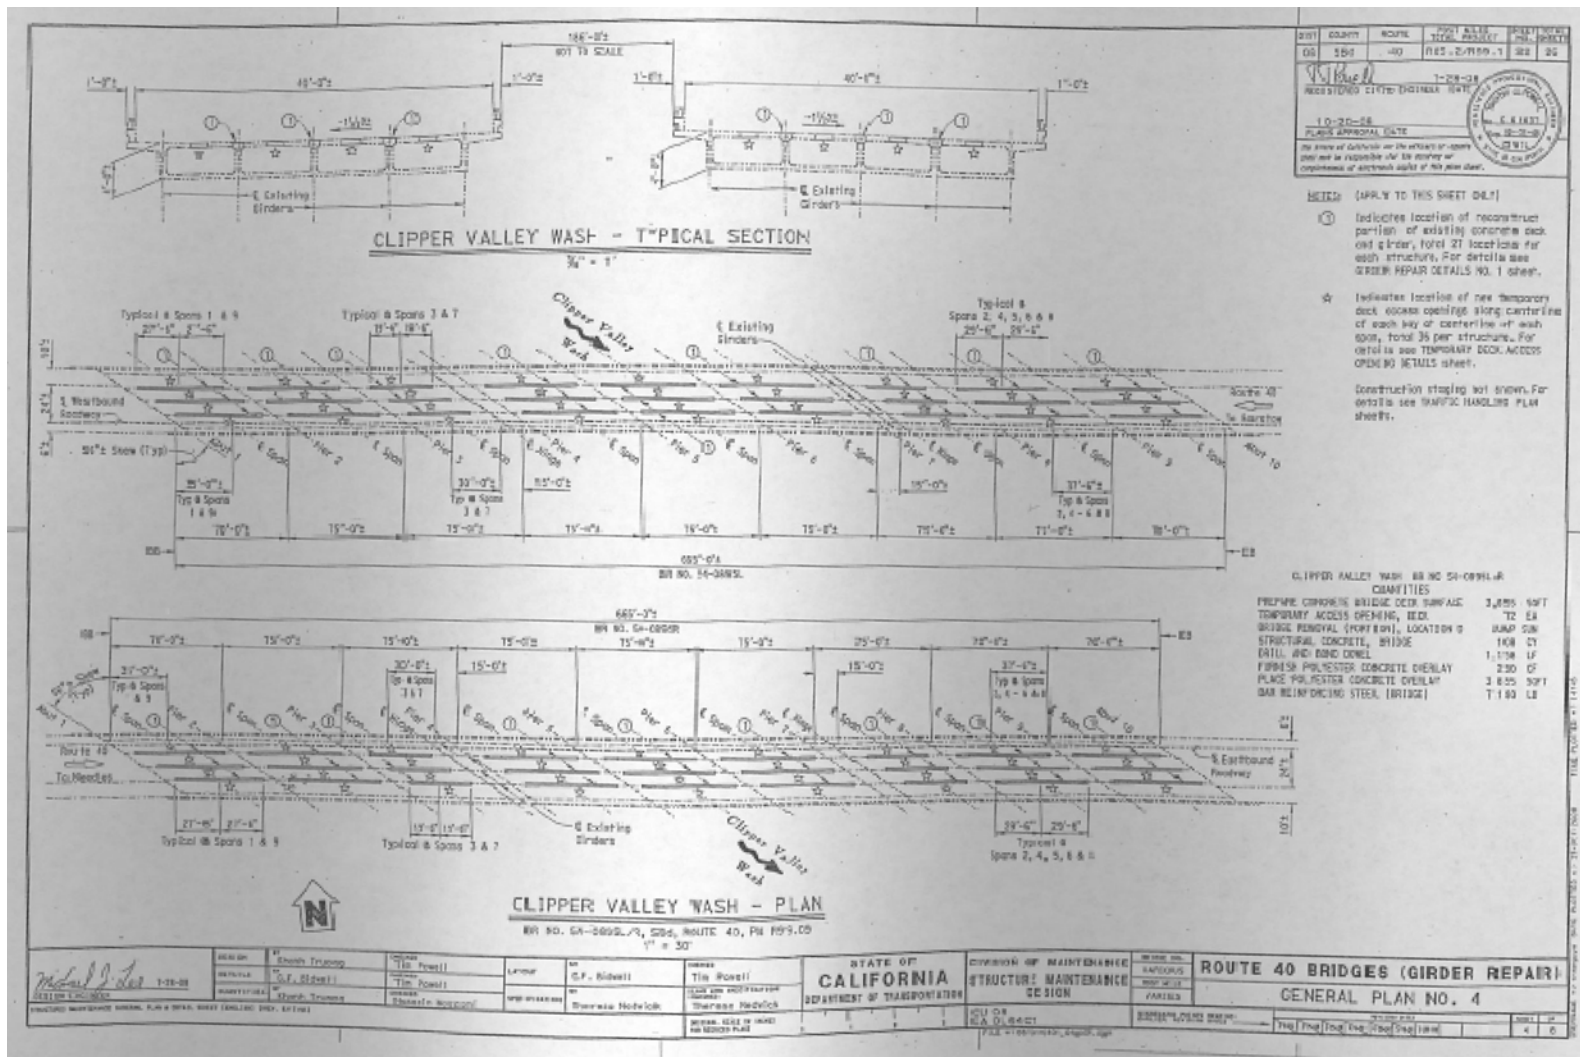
Typical section and plan for the Clipper Valley Wash Bridges (Rt. and Lt.).
